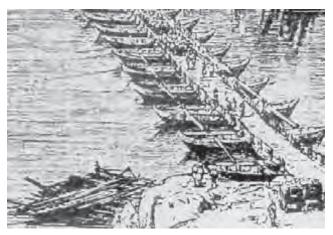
Bridge made out of ships (SETRA (2006a))
